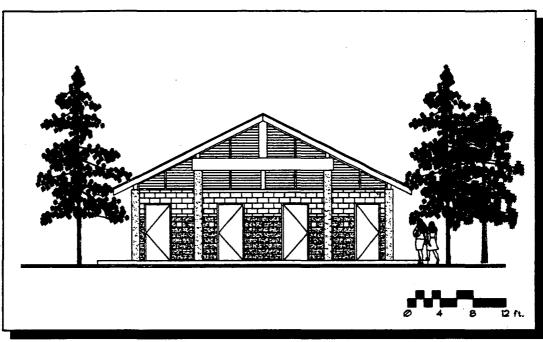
Restroom/Shower Facility - Plan View © Metro
